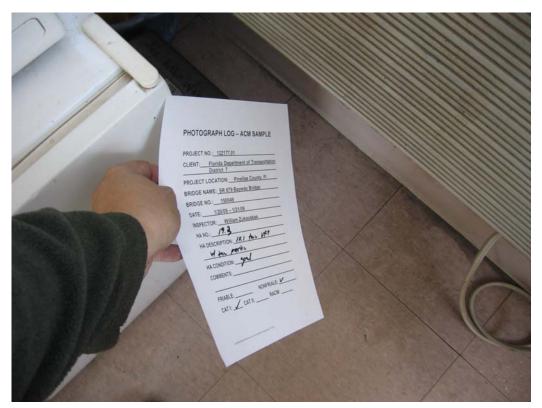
01/21/09 - SAMPLE 19.3 - HA 19 1'X 1' TAN VINYL FLOOR TILE WITH TAN MASTIC TENDER HOUSE AT BRIDGE LEVEL
